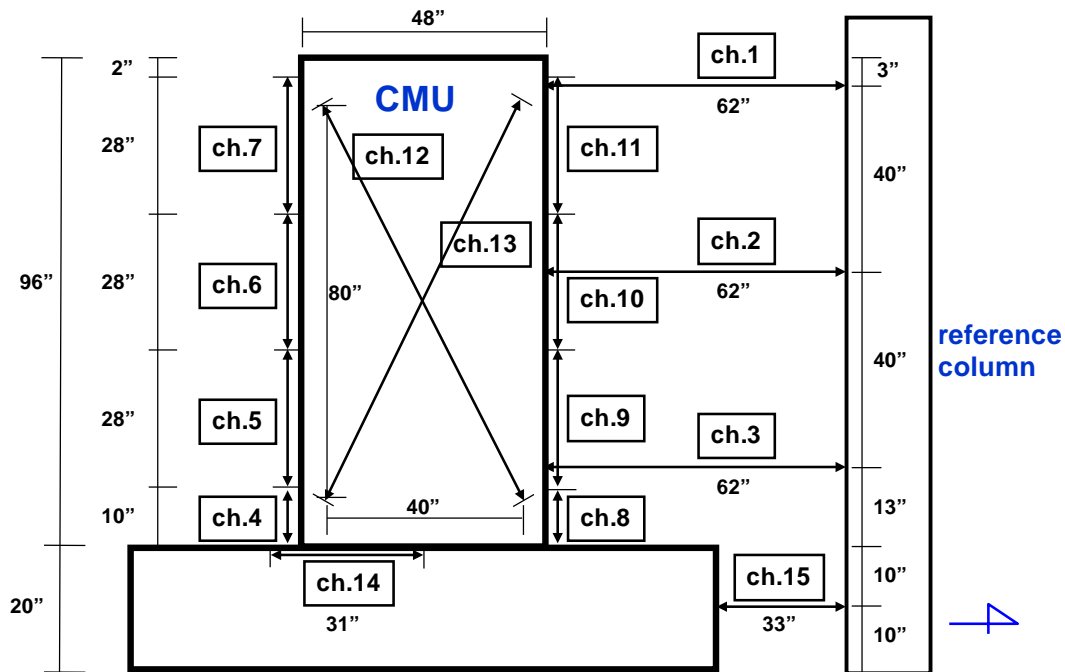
Instrumentation of quasi-static, in-plane CMU wall specimens (CMU side)
